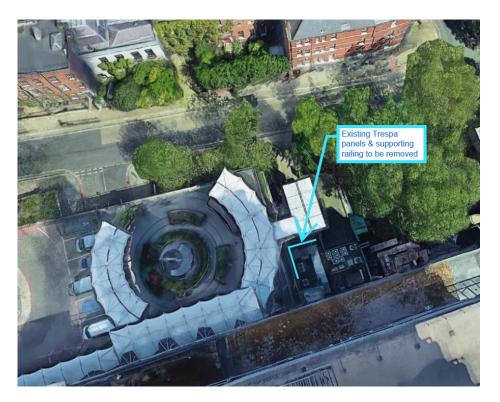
Existing railing: trespa panel railing to be remove to facilitate the installation of the new fencing
